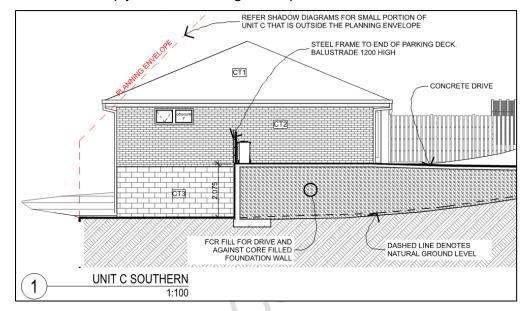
Elevation of proposed Unit C showing building envelope encroachment.
